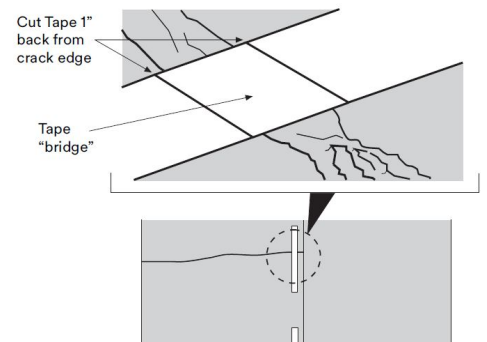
Cutting Tape Applied Over Cracks and Expansion Joints
